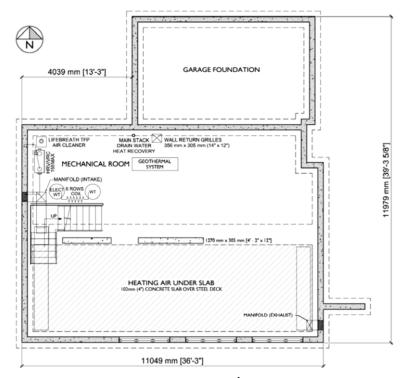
Basement floor plan of ÉcoTerra (CMHC, 2007)
